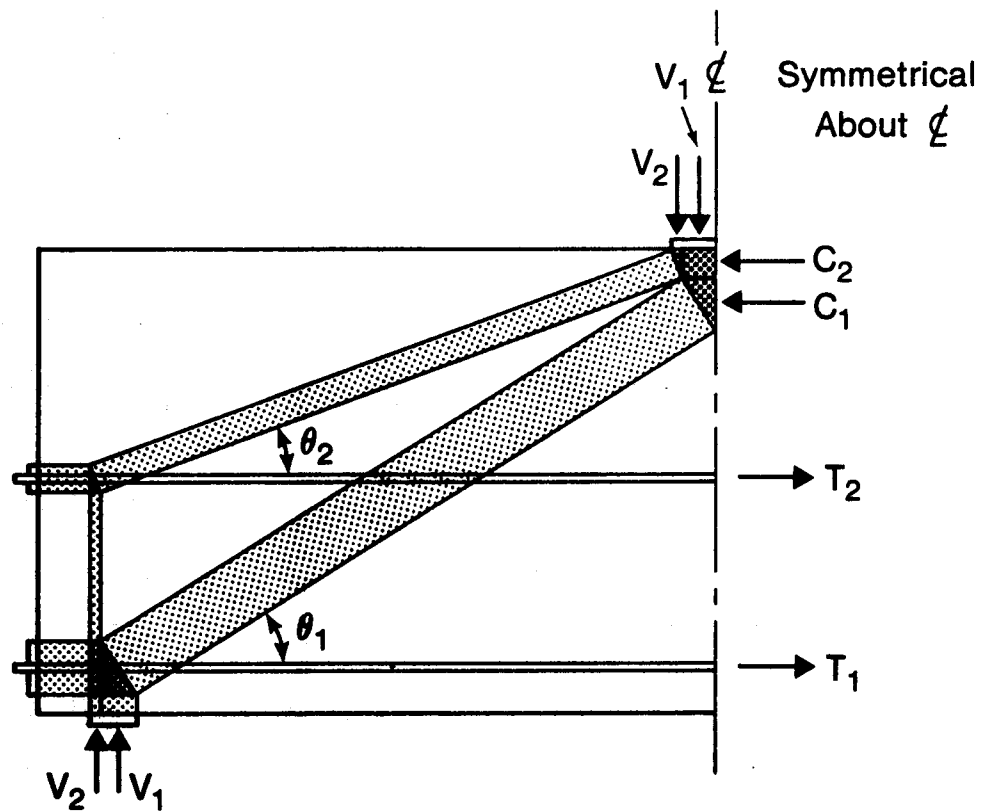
Plastic Truss Model for Beam Without Web Reinforcement
